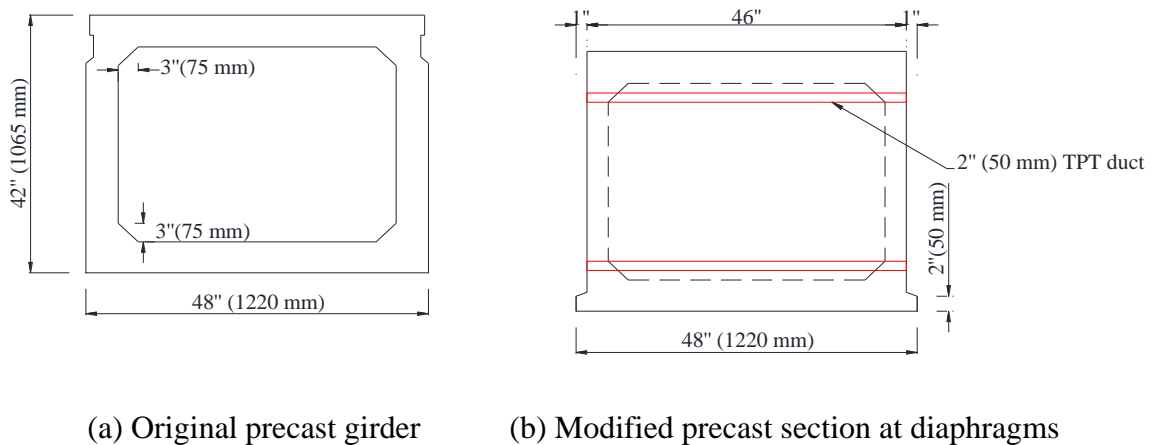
Modifications to precast concrete sections (Reproduced from El-Remaily et al. 1996)
